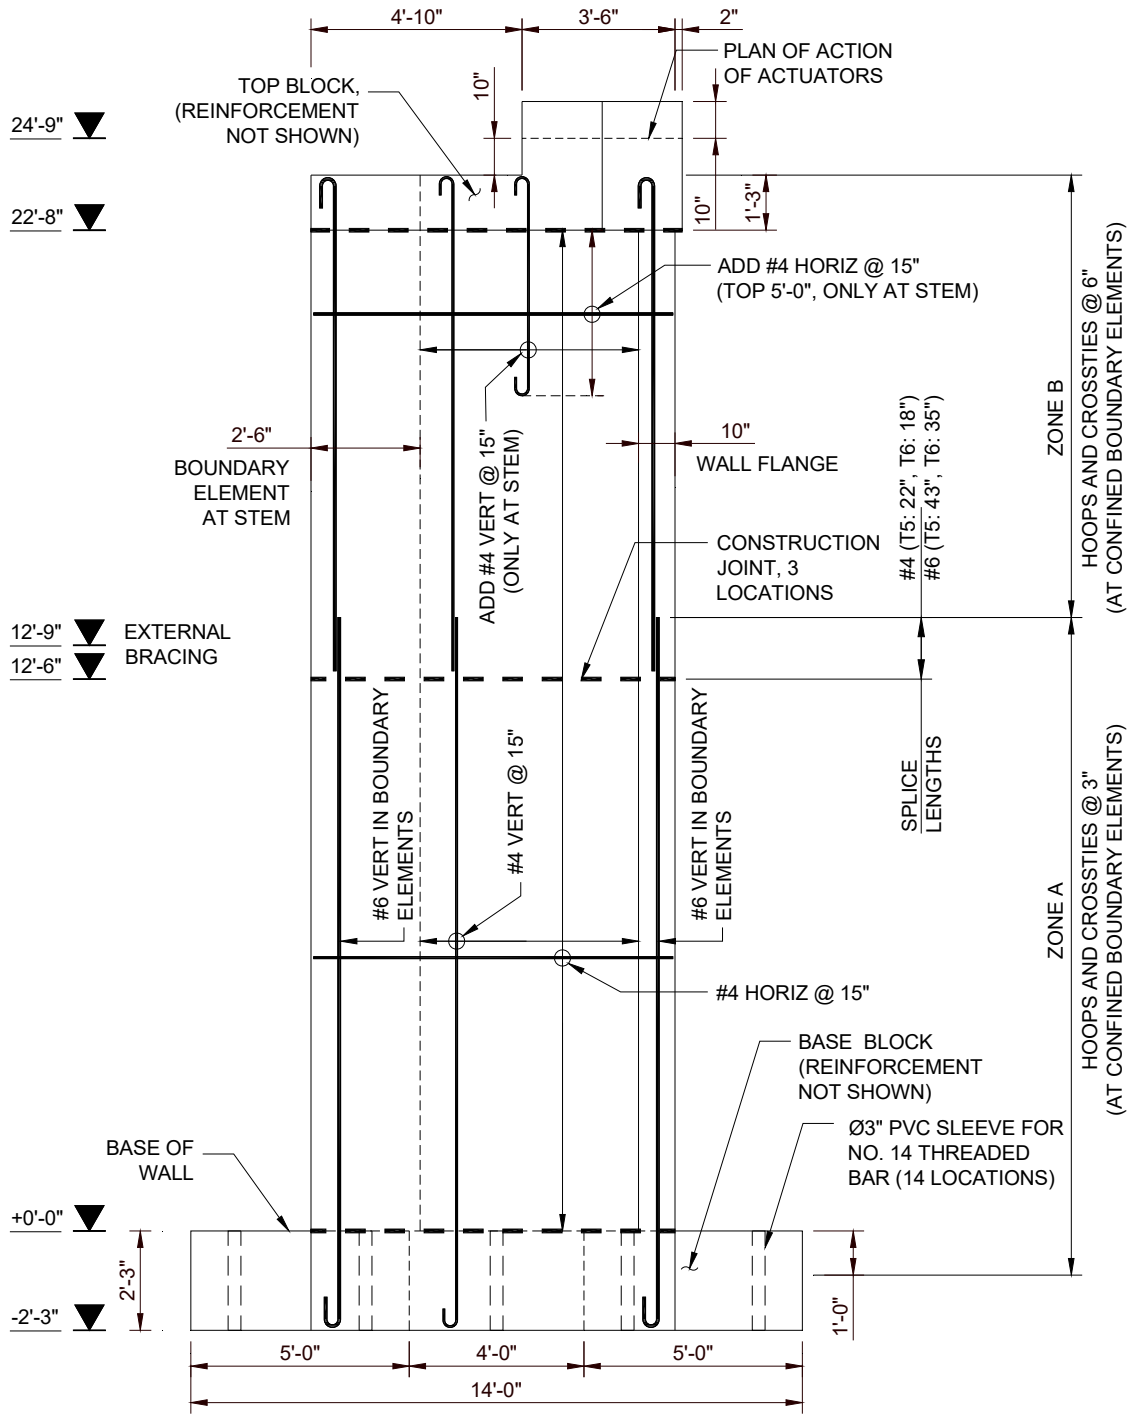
Typical wall elevation (1 in. = 25.4 mm)
